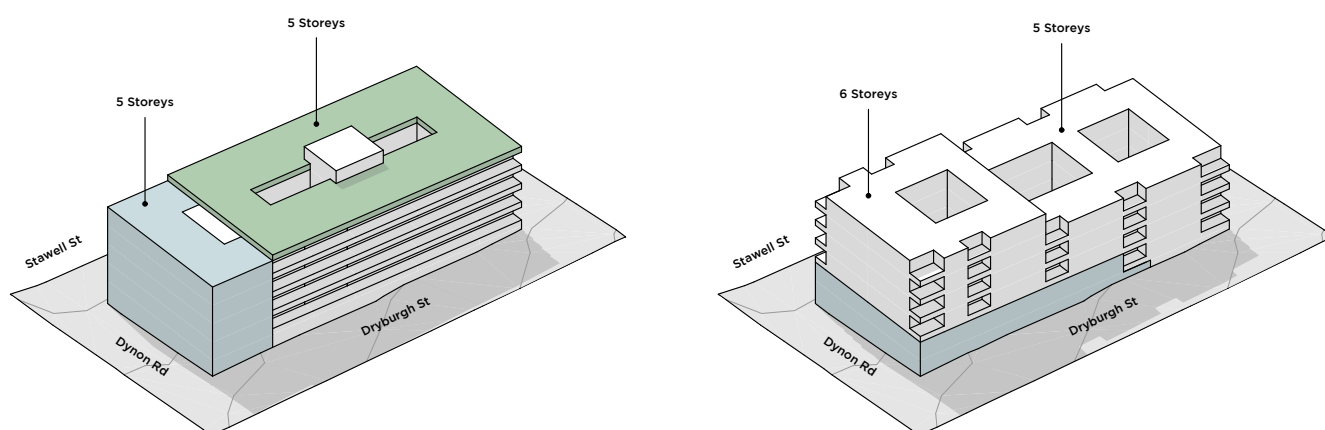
Built form testing to show the proposed floor area ratio and built form controls on a large corner site in Station Precinct (DDO28). Images are indicative only to test the proposed controls and are not representative of actual building proposals (West Melbourne Built Form Testing, Breathe Architecture).
